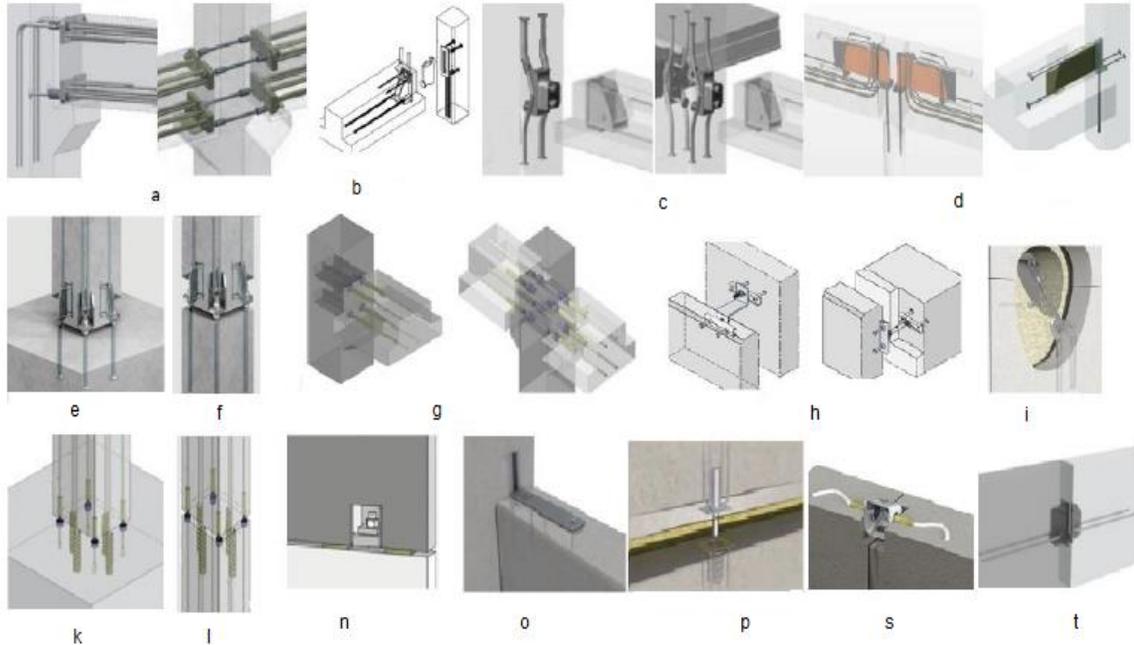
Examples of options for "dry" joints when using reinforced concrete elements: a - anchor-bolted beam-column; b — inserted beam-column; c - insert beam-column; d - insert beam-column; e — anchor-bolted column-foundation; f - column – column; g - anchor-bolted beam-column; h - anchor and bolt facade systems; i - anchor and bolt facade systems; k — anchor-bolted column-foundation; l - anchor-bolted column-column; n — anchor-bolted panel-panel; o - anchor-bolted panel-panel; p - anchor-bolted panel-panel; s - anchor-bolted panel-panel; t - snap-on panel-panel
